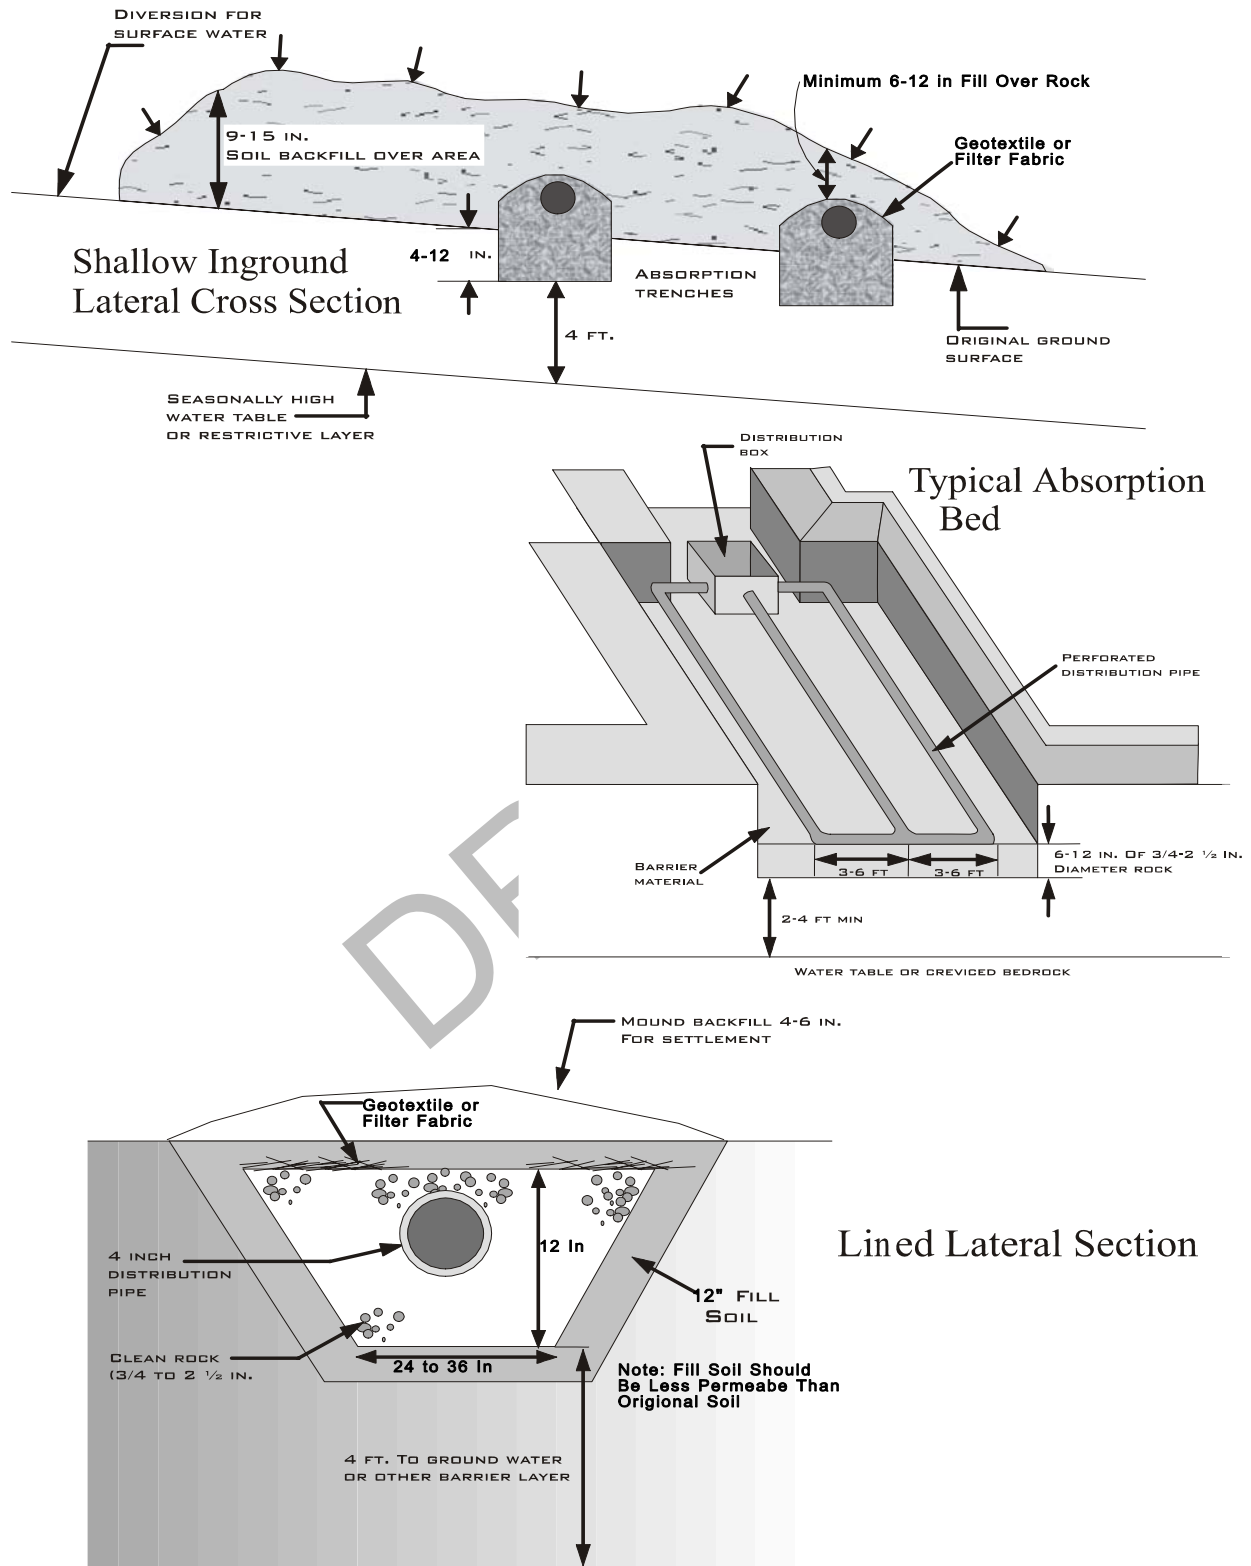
Typical Shallow In-ground, Absorption Bed, and Lined Lateral Sections
